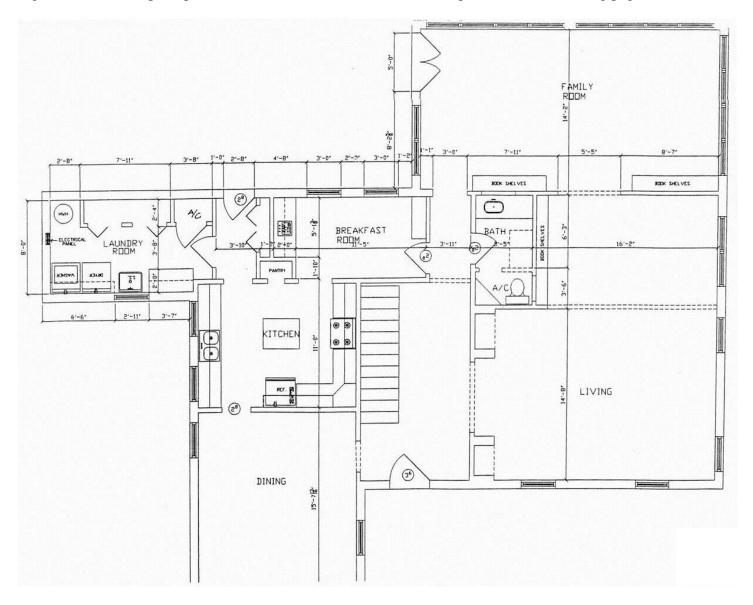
First floor plan, existing. (Adapted from the electrical plans prepared in 2003.)
